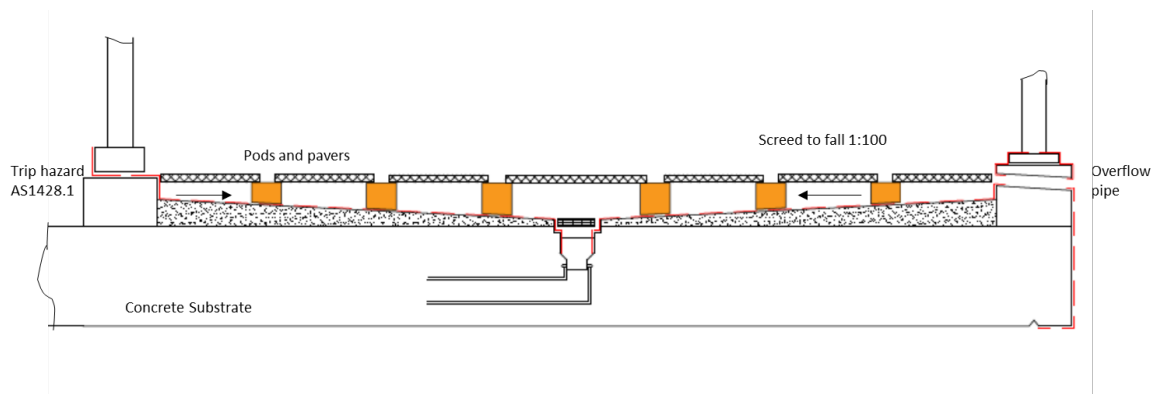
Typical concrete balcony construction details (screed to falls and no set down)
